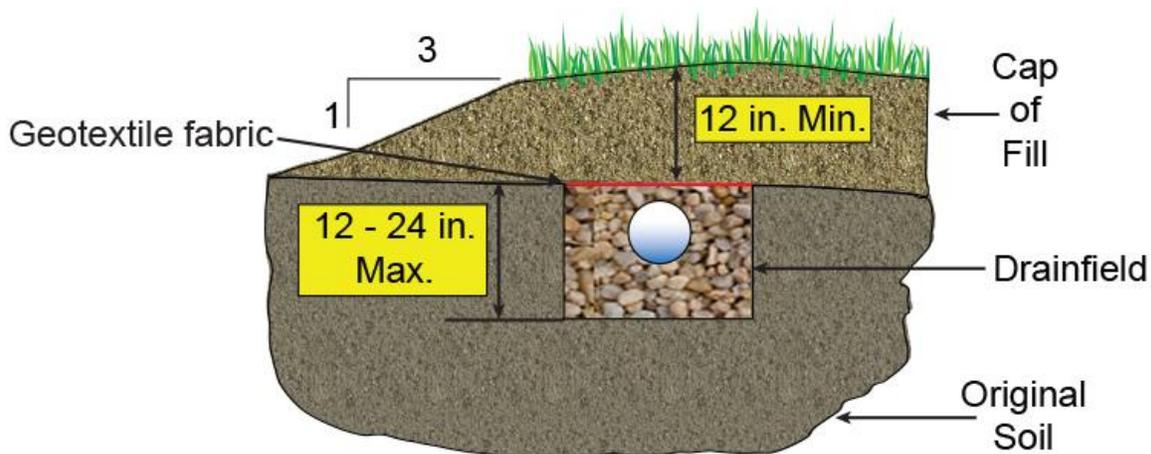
Cross-sectional view of a below-grade capping fill trench.
